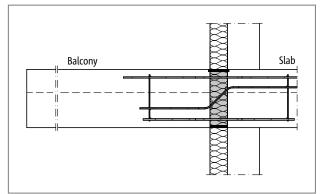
Schöck Isokorb® XT type B: Balcony construction with freely cantilevered downstand beams
